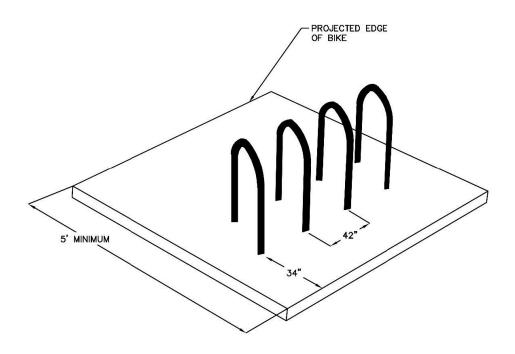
Bike Rack Spacing (Away from Vertical Obstructions)
